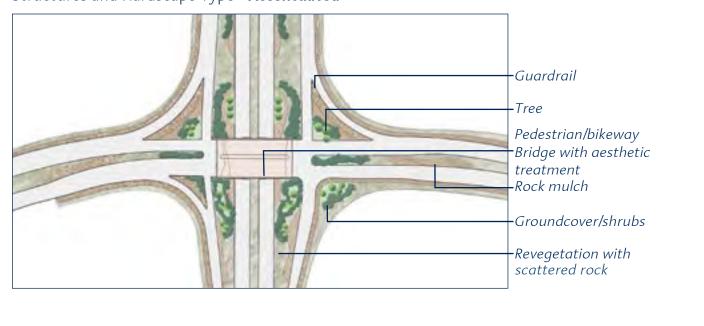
BYPASS/ELEVATED HIGHWAY INTERSECTION
